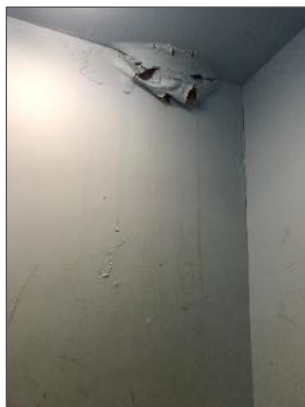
Water damage on the wall and ceiling in Storage Room #2.
